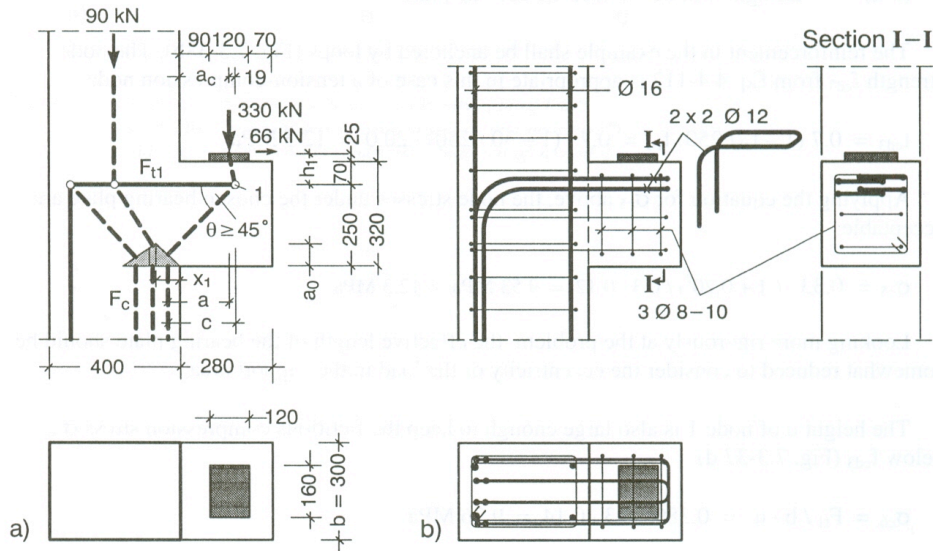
Corbel (numerical example). Concrete C30, steel S500.
